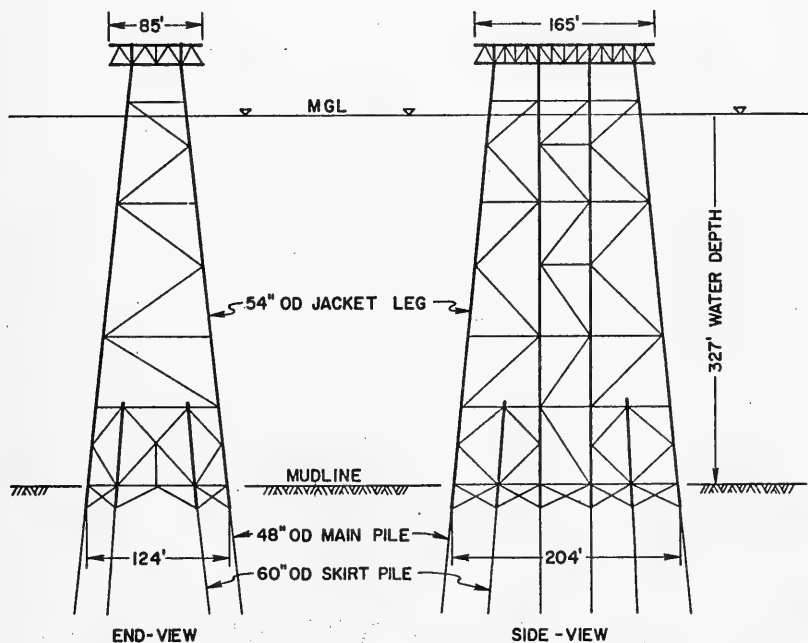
Structure as installed in 1968 (Sterling and Strohbeck, 1973).
